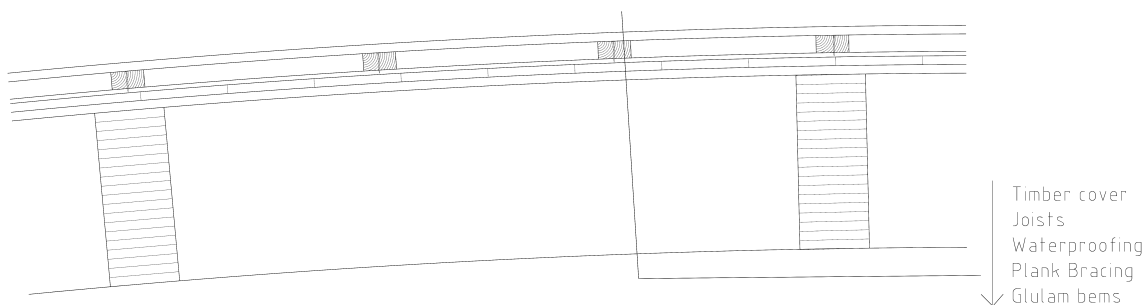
Section of the proposed build of the roof used as a basis for calculations
